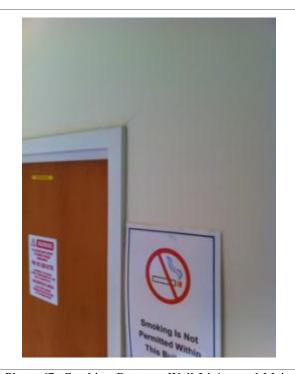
Cracking Between Wall Lining and Main Boat Shed Door Architraves
